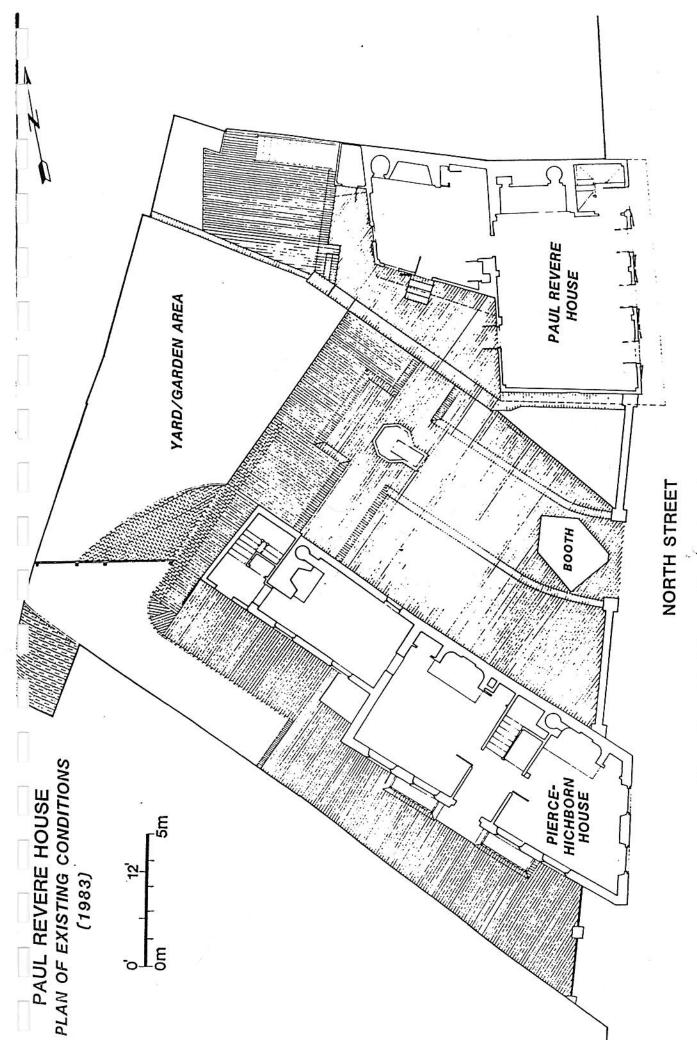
Paul Revere House: Plan of existing conditions (1983).
